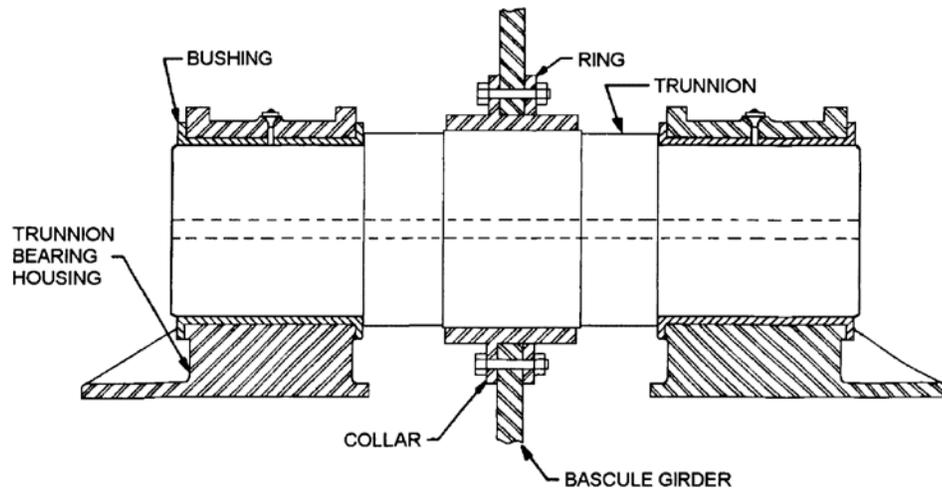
Sectional detail of symmetric trunnion shaft assembly
